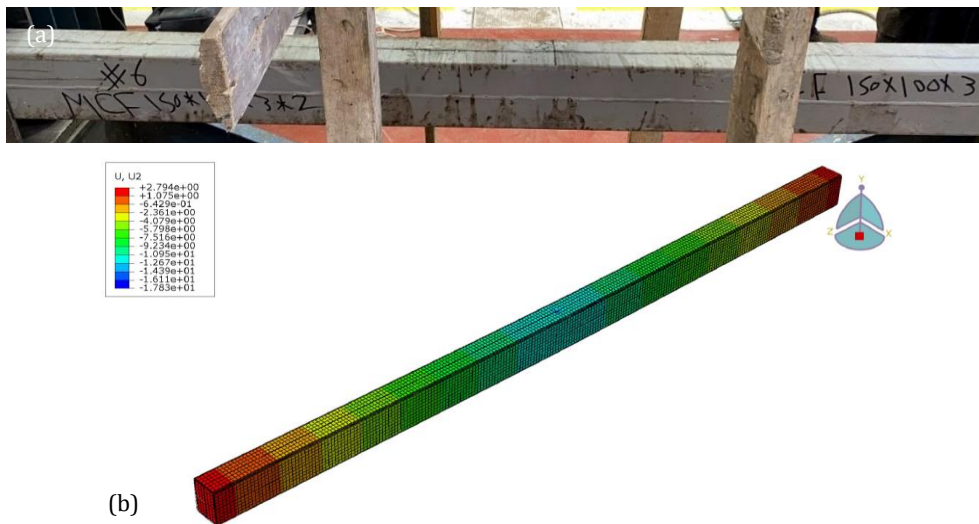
Deformed shape of 100X150X3X2 filled multi-cell column (MCC-F):
